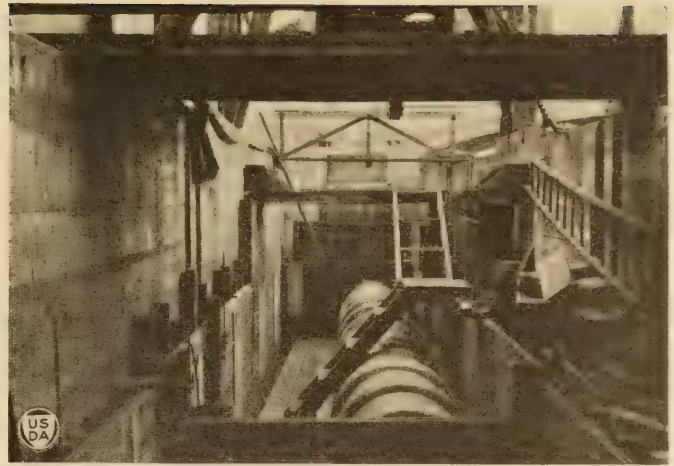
30-inch vitrified clay pipe in place for testing.
